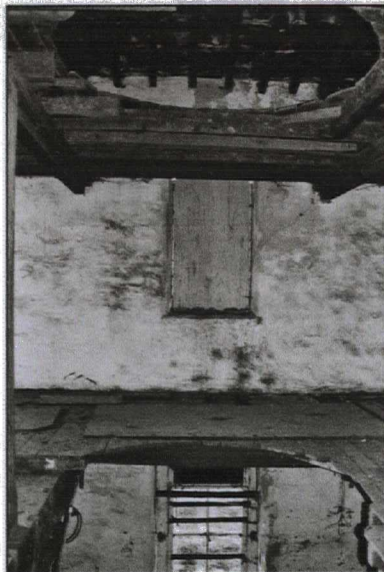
(93: 4/11) Room 2/4: sectional view of the two floors, from the north
